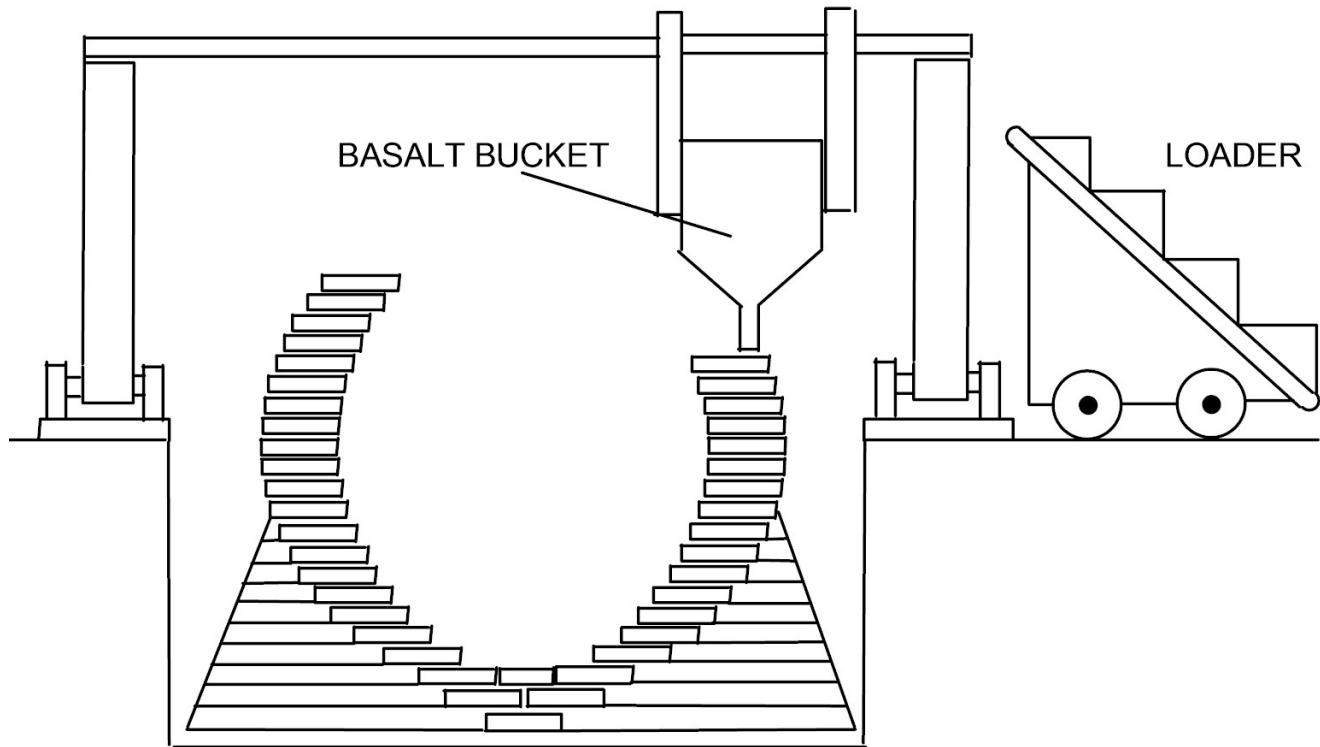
Cross sectional diagram of machine printing cylindrical habitat with extruded molten basalt.
